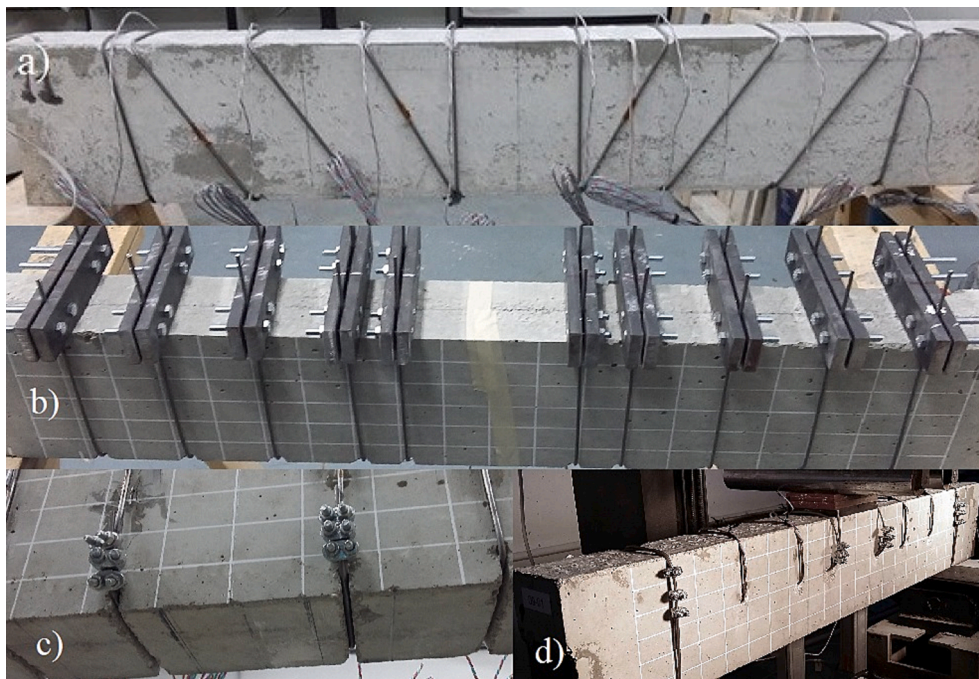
a) Rear view of a beam strengthened by continuous rectangular spiral (beams 2.1 to 5.2). b) Beam strengthened by U-shape stirrups (8.1–8.2 and 10.1–10.2). c) Detail of grooves on a beam (7.1–7.2). d) Continuous rectangular spiral strengthen the compression chord of a beam (9.1–9.2).
